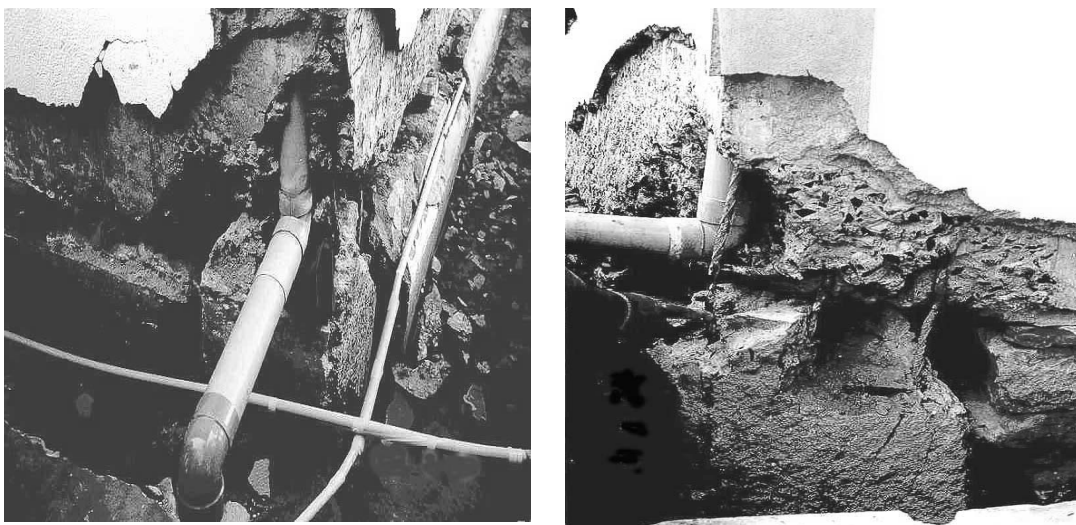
Separation of ground beam and column junctions caused by concrete crushing in Sukhpur. Damage made worse by the weakening presence of a plastic pipe within the column.
